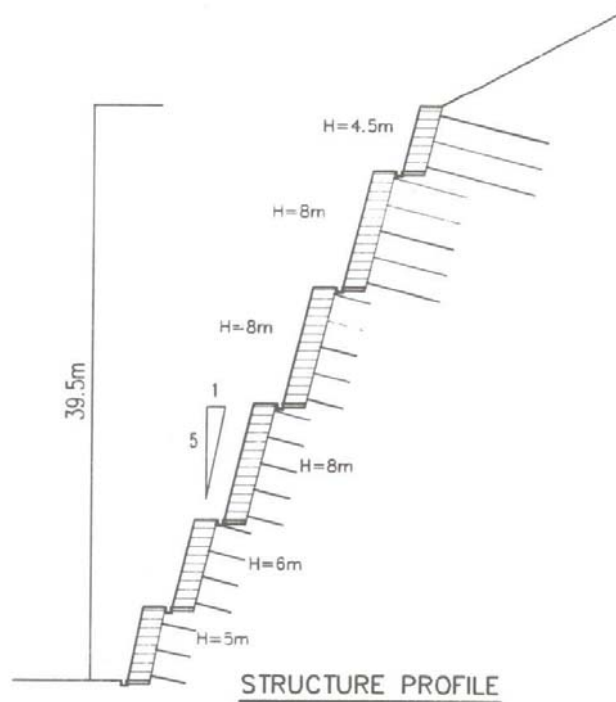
Illustration. A multi-nailing shoring system combined with MSE construction.⁽⁴⁶⁾
